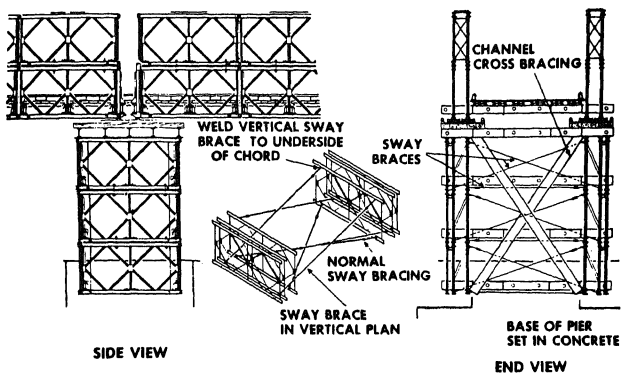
Expedient cross bracing in three-story panel crib pier.
